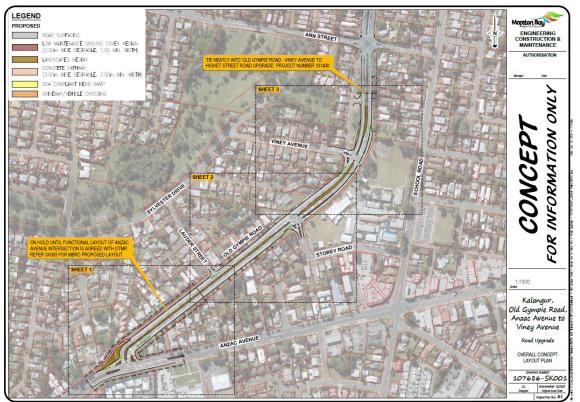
Concept/Locality Plan (Anzac to Viney)
